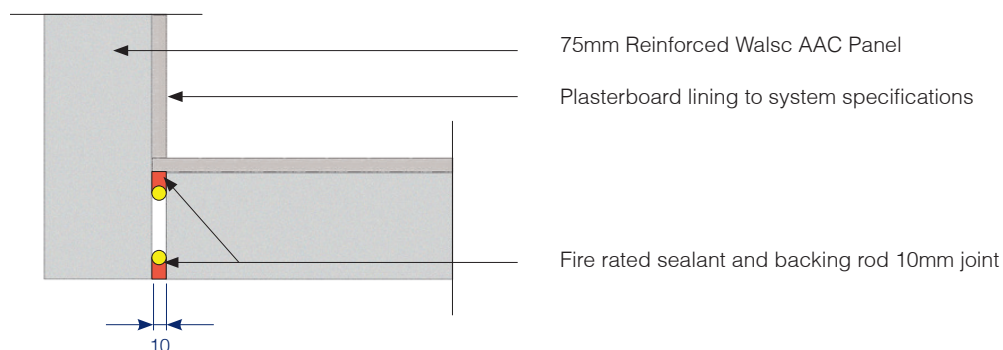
Service Shaft Wall Option 1 Corner Control Joint Detail
